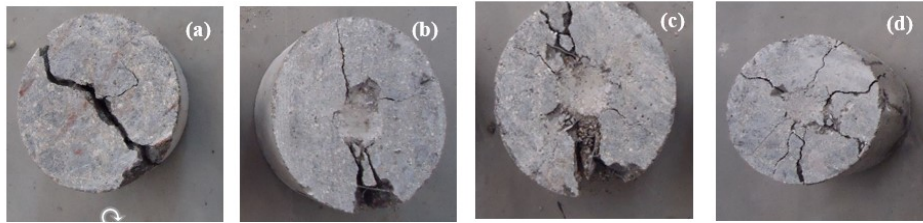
Failure Pattern of Concrete specimens (a) QL0non-fibrous concrete specimen (b) QL10-F 0.5 (c) QL10-F 1.0 and (d) QL10-F 1.5.
